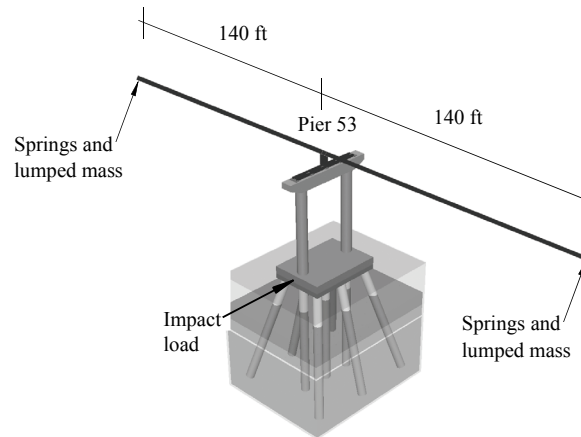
New St. George Island Bridge, Pier 53 (NSG-OFF) OPTS model
